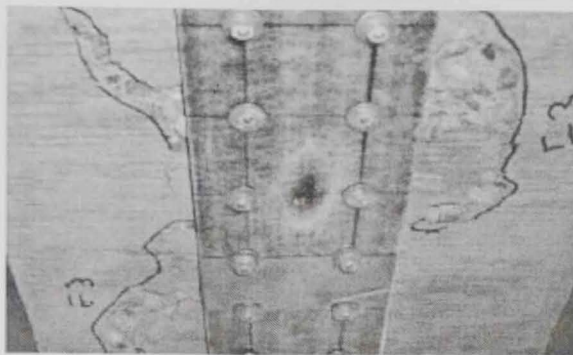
Typical concrete spalling created while attaching composite strip
